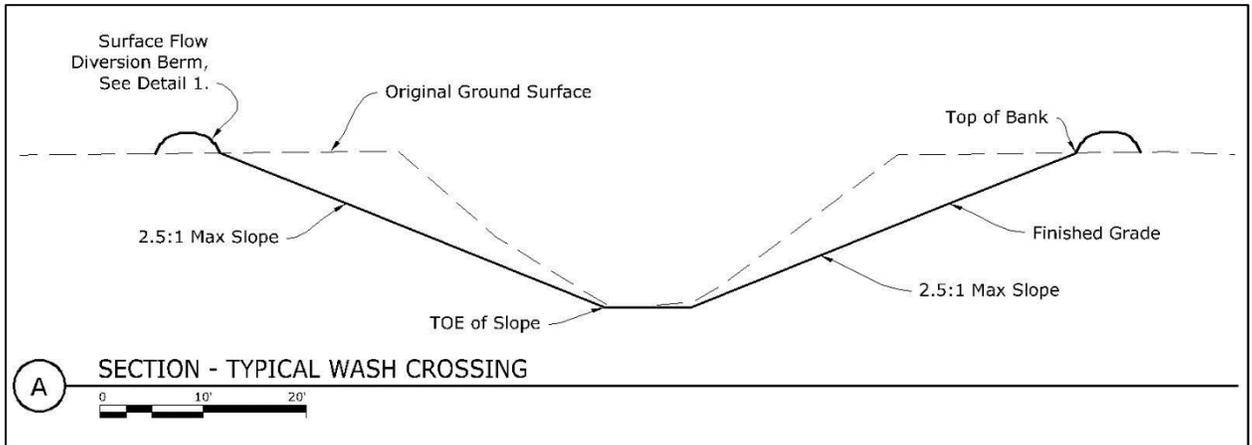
Detailed section of typical wash crossing for bank slopes greater than 2.5H:2V.
